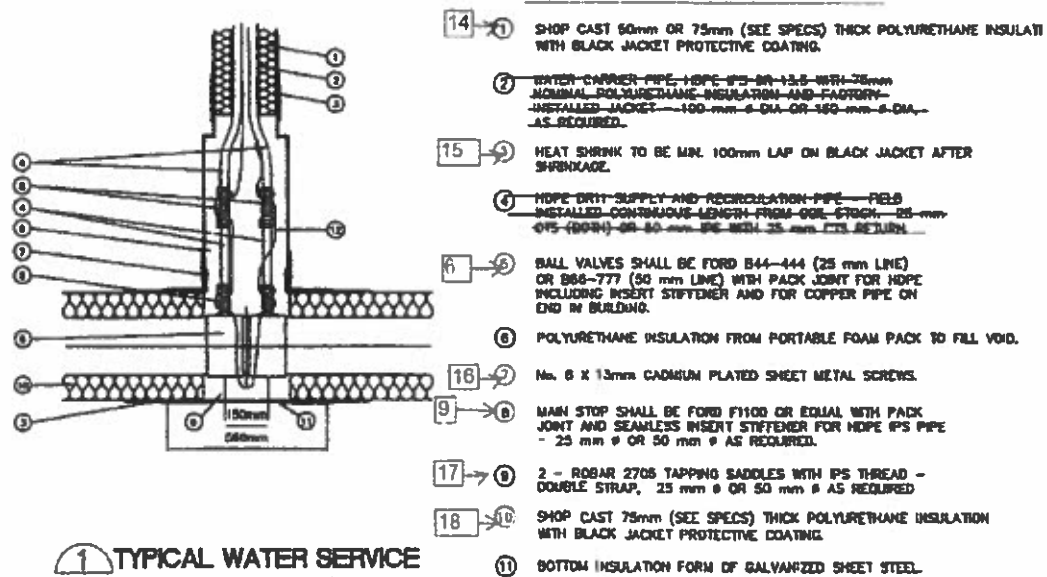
Detail 1 - from drawing C-330 - Water service connection kit at main - Plan view
